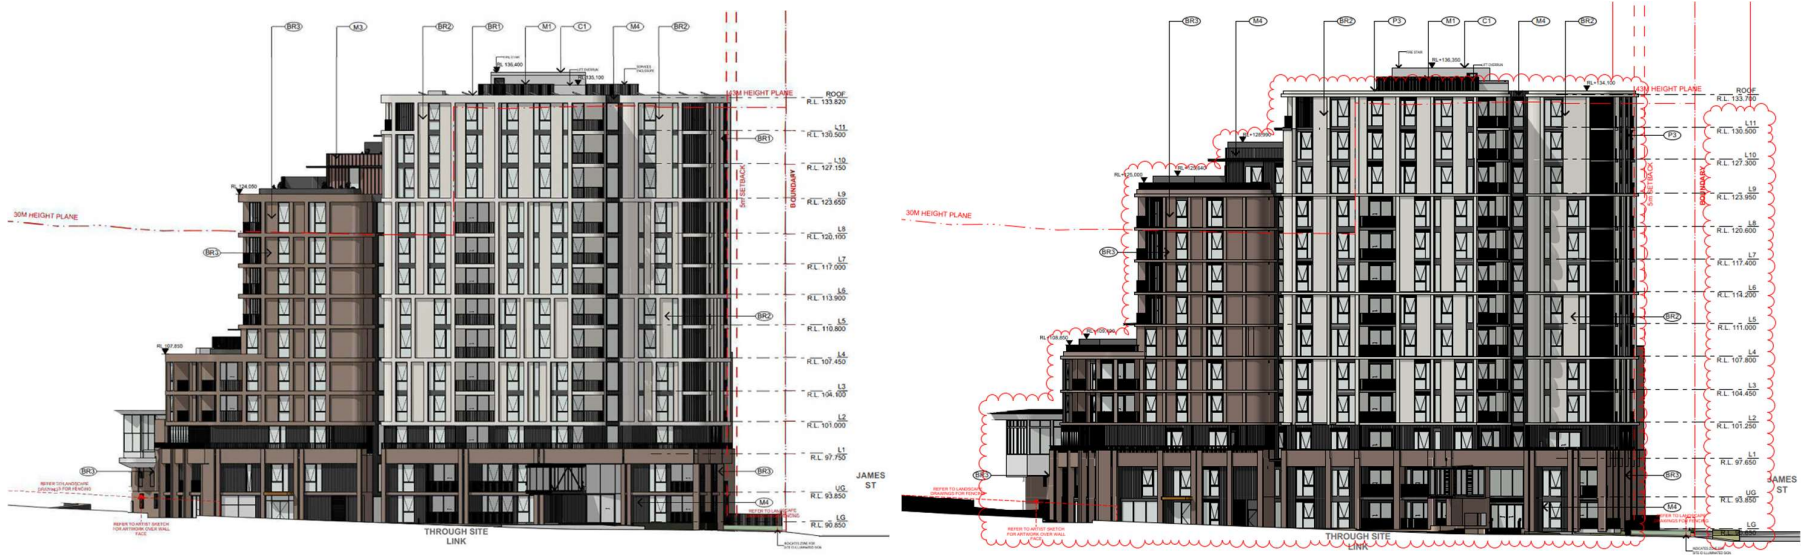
Approved and Proposed East Elevation of Building B (1 of 2)
